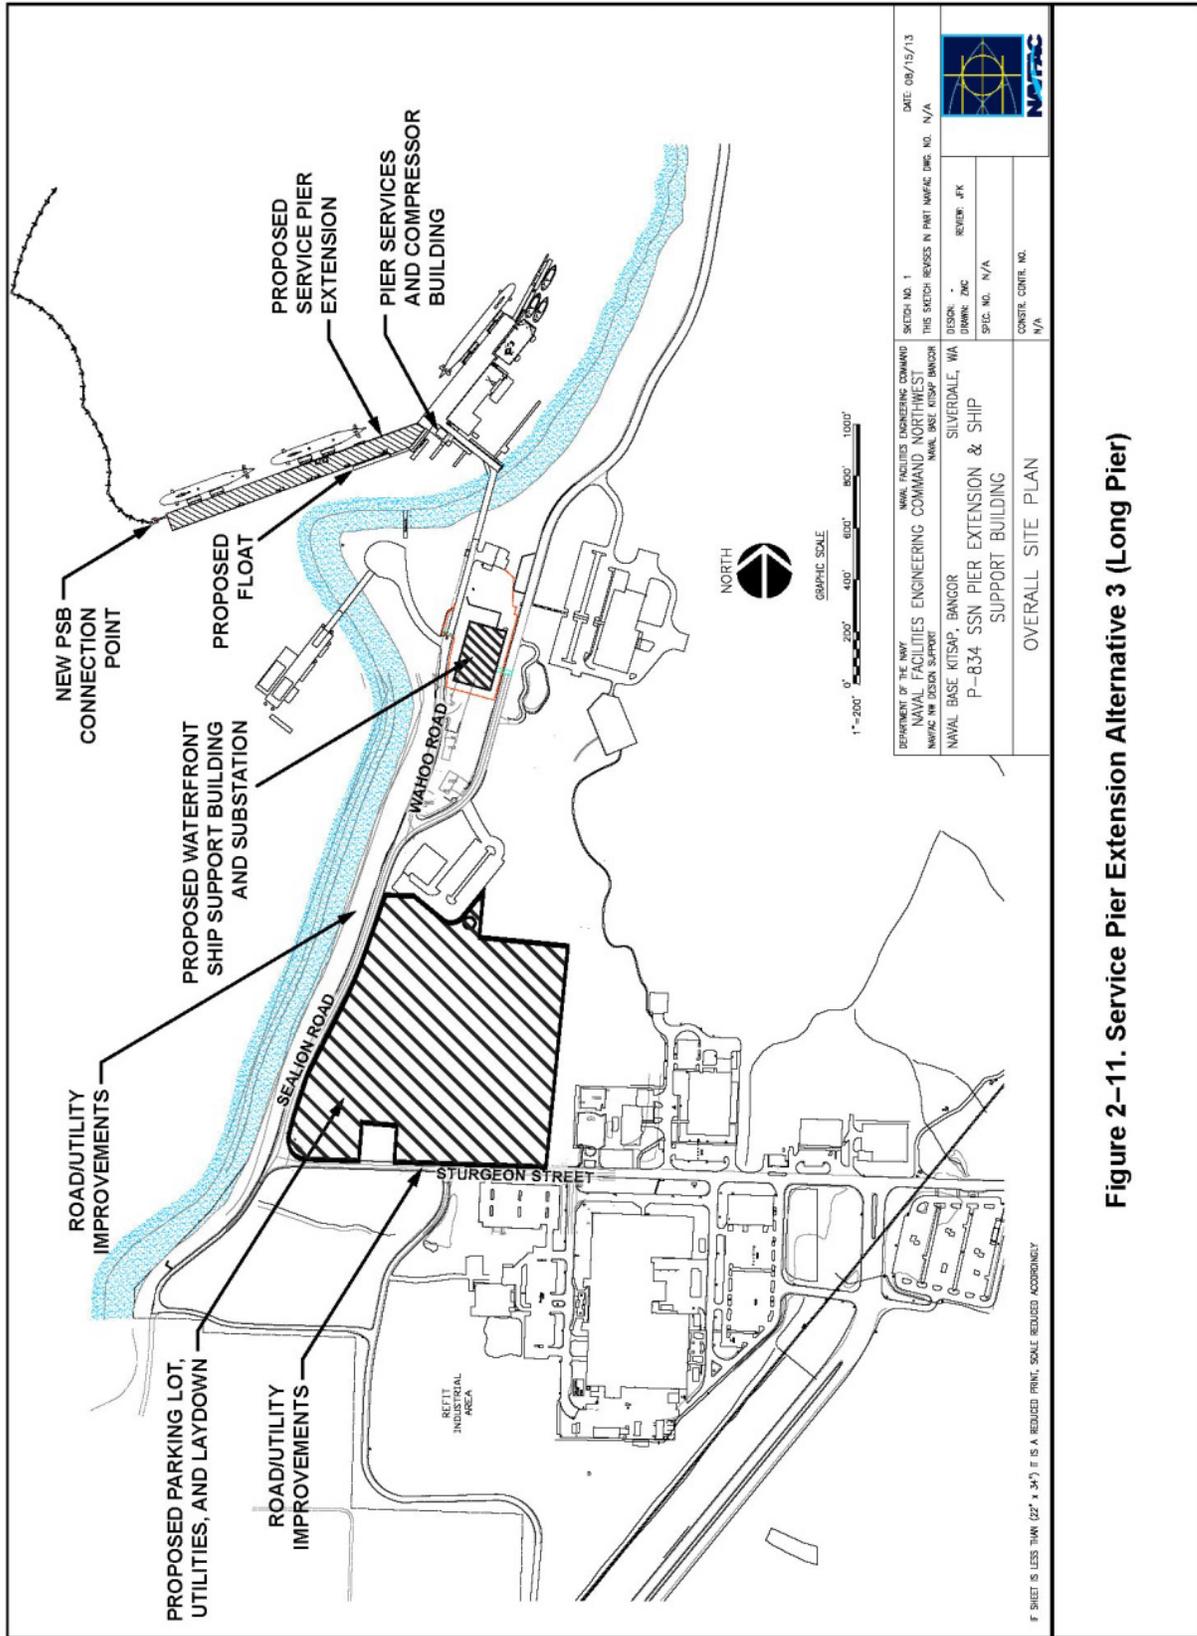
Service Pier Extension Alternative 3 (Long Pier)
